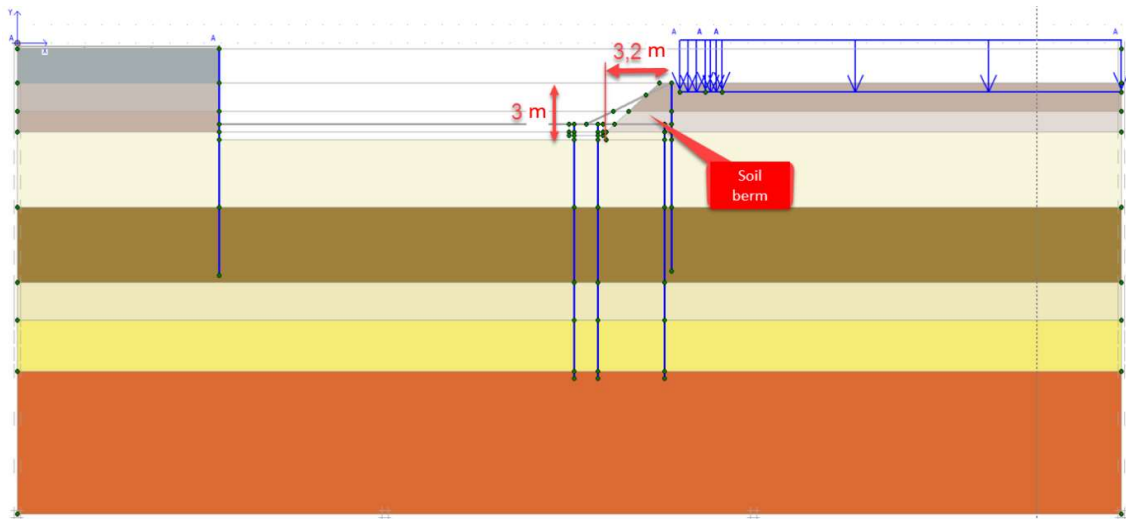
Stage 3 of the excavation shoring erection in section 1-1
